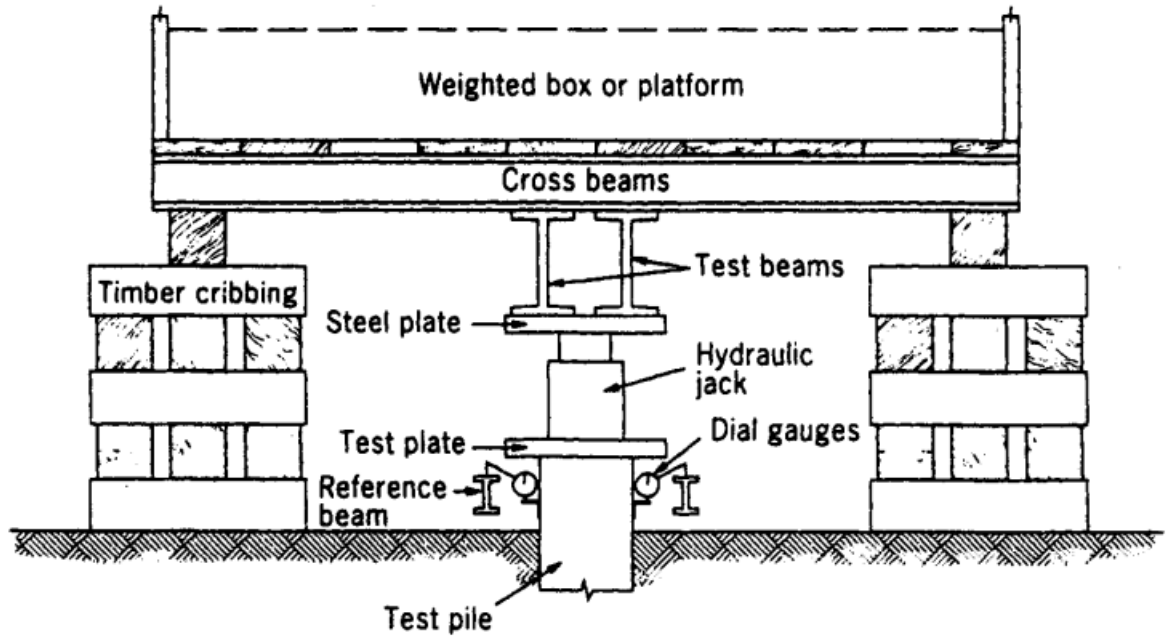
Typical setup for pile load test in compression (ASTM Institute, 1977).
